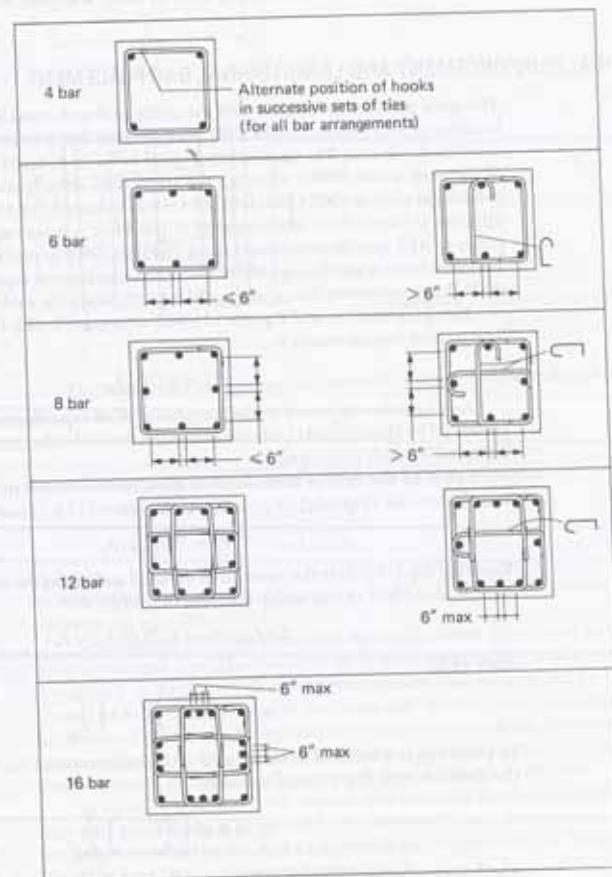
Common column tie arrangements. (Adapted from Reference 2.26.)
